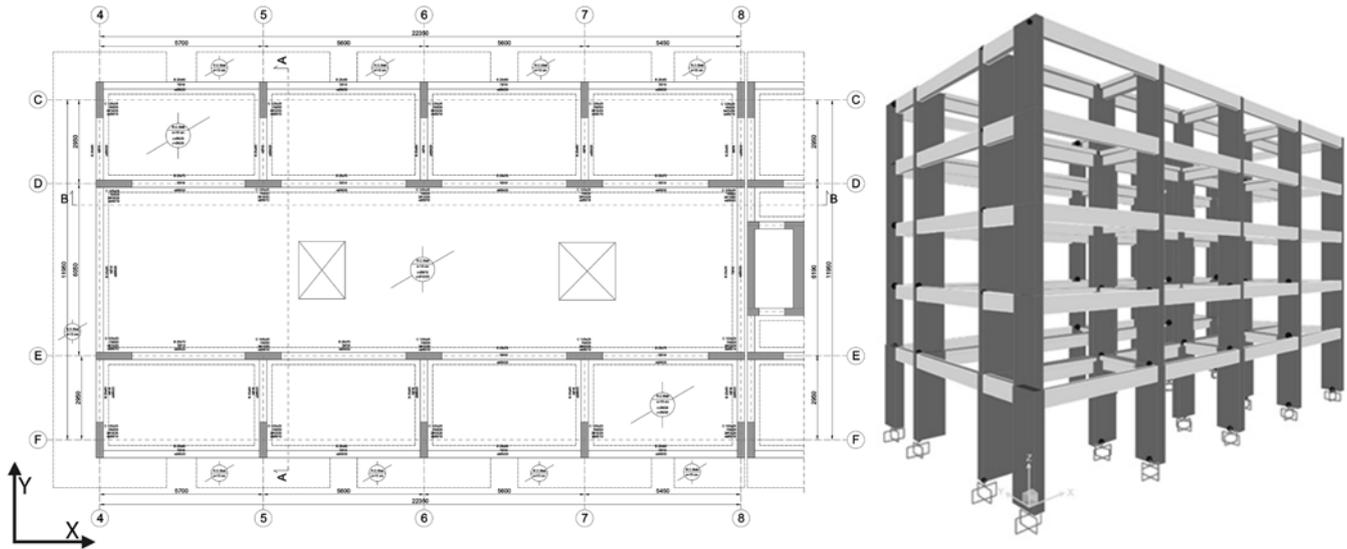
Structural plan of the type floor and a picture of the finite element model.
